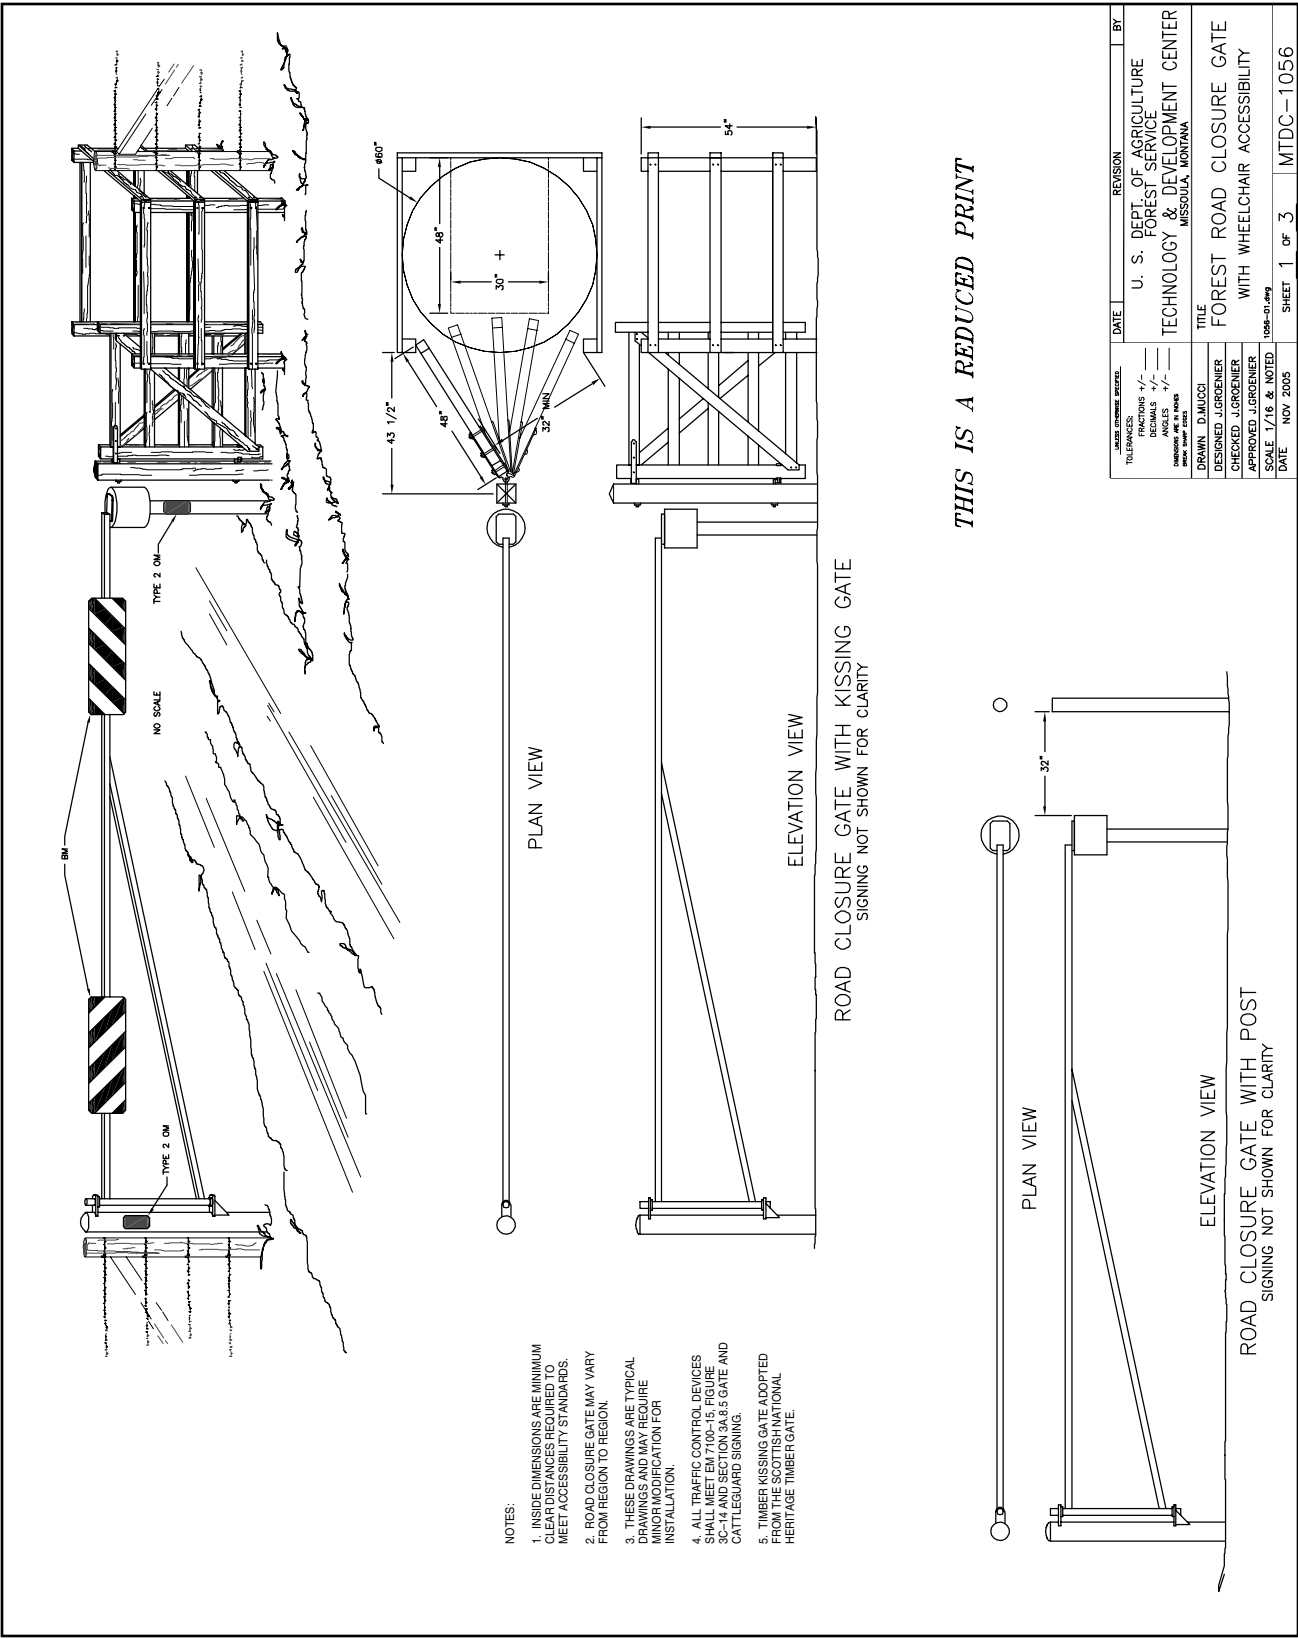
Accessible road closure gate drawing (MTDC-1056-01) with a kissing gate and post that allow accessibility.
